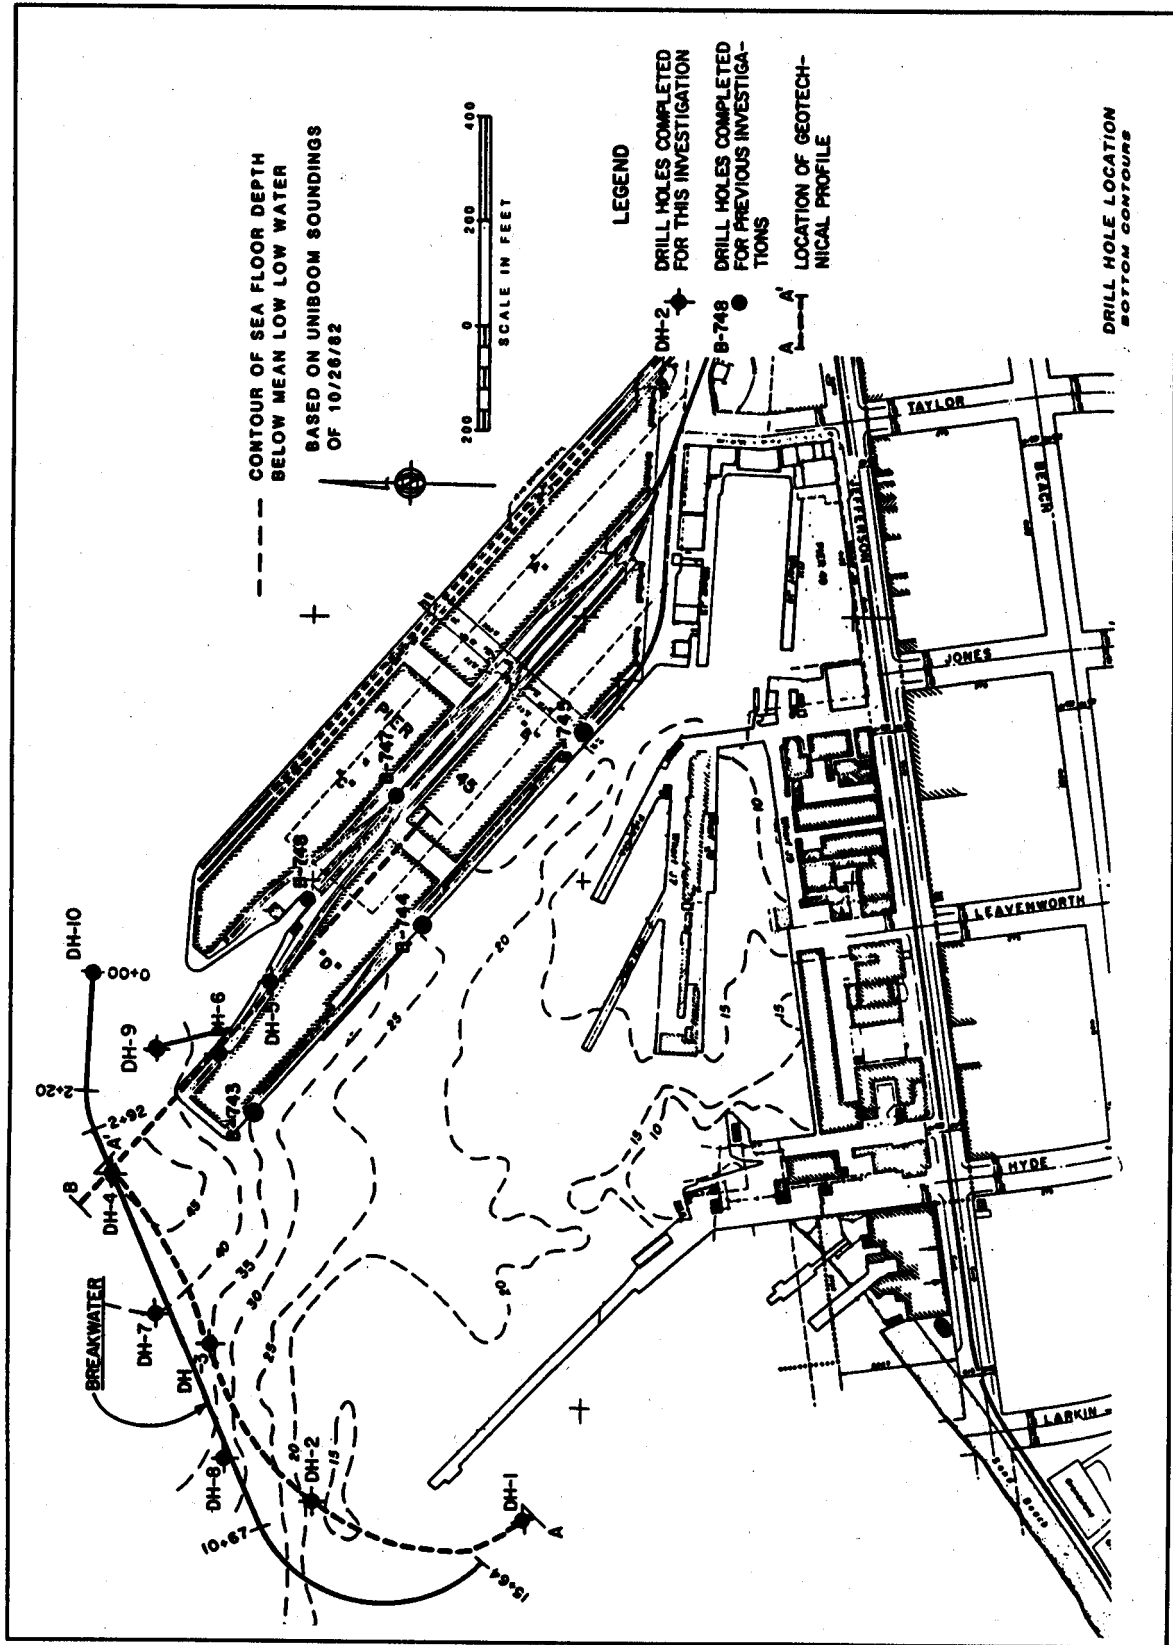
Plan view of boring and geotechnical profile locations (from GDM)
